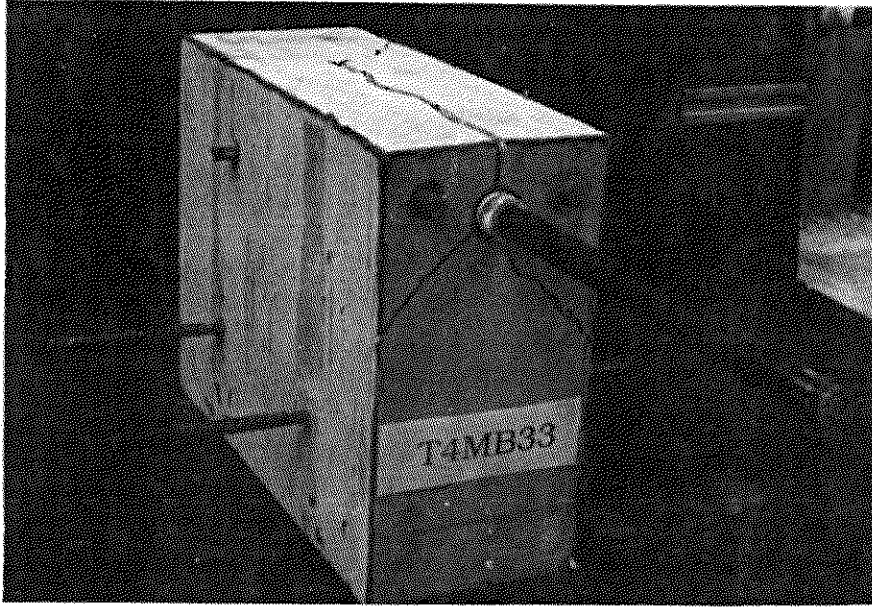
Beam-end test specimen without transverse stirrups after failure. Cracks on the front face of specimen form an inverted Y centered on the test bar
